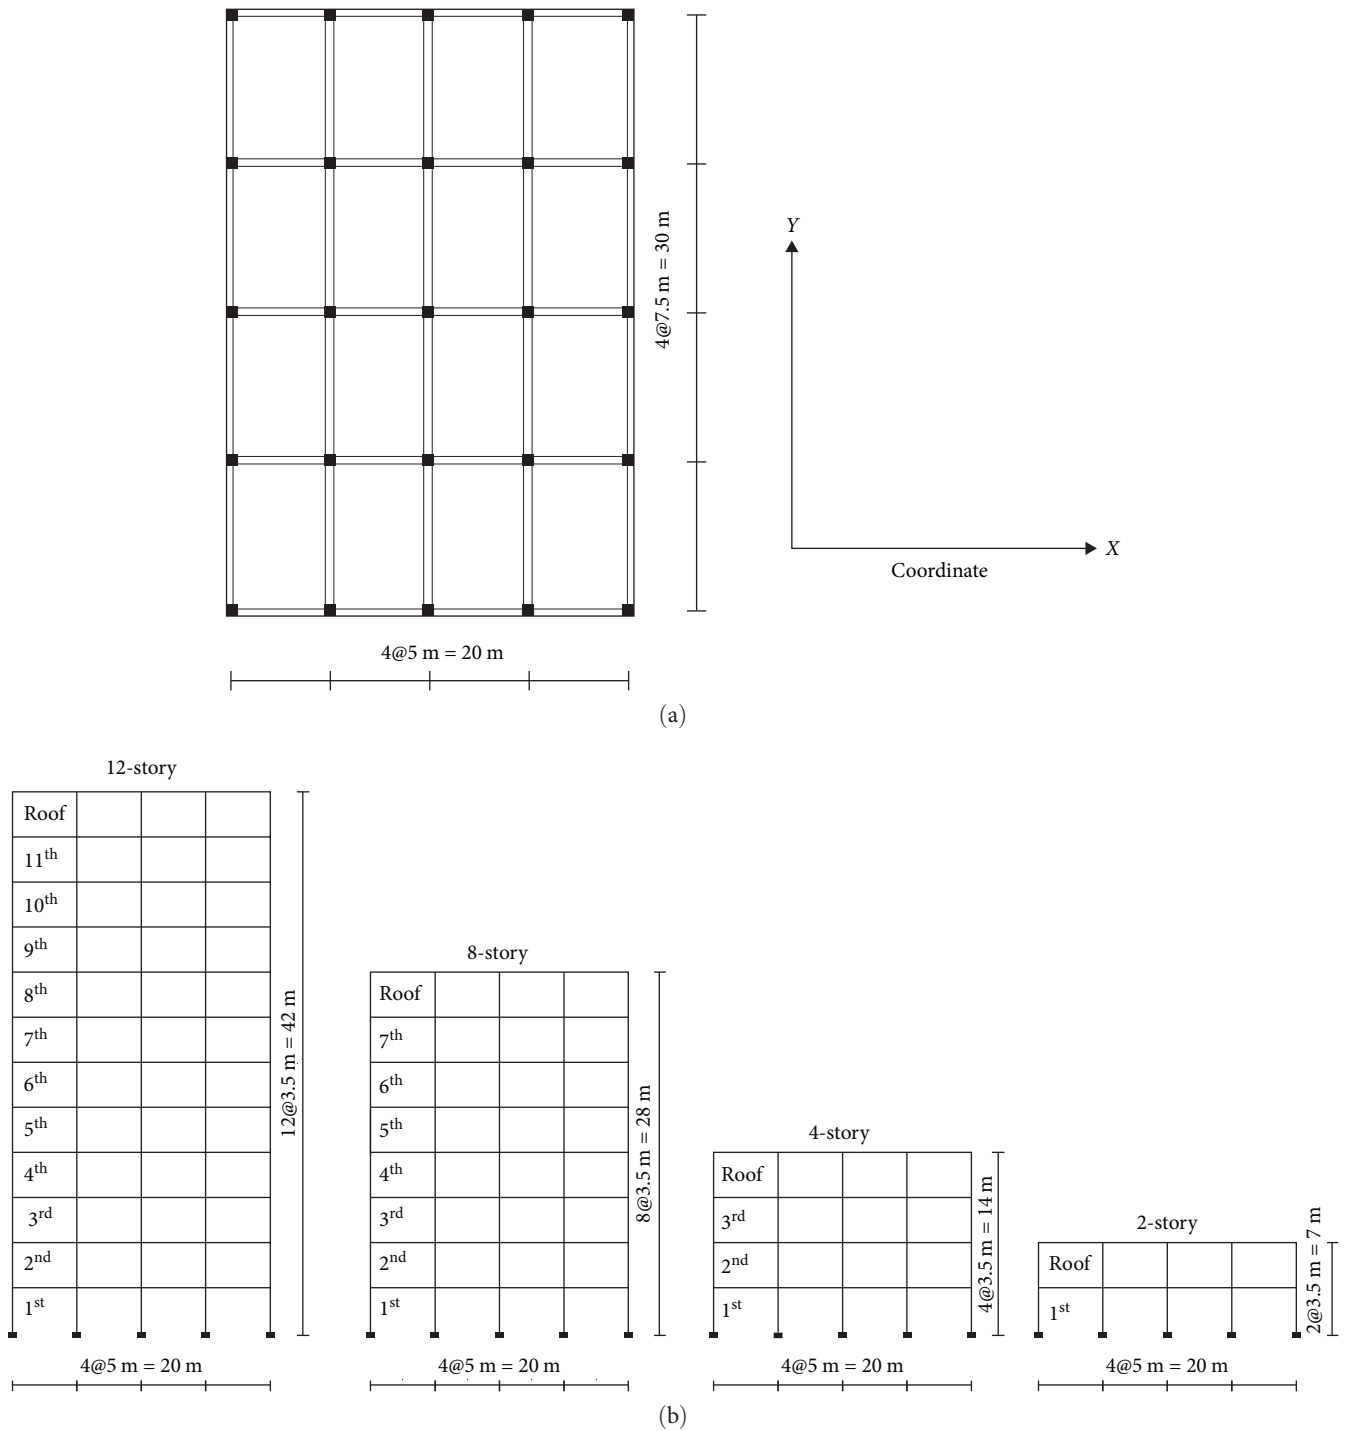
(a) Typical floor plan of model buildings and (b) 2-, 4-, 8-, and 12-story model frames.
